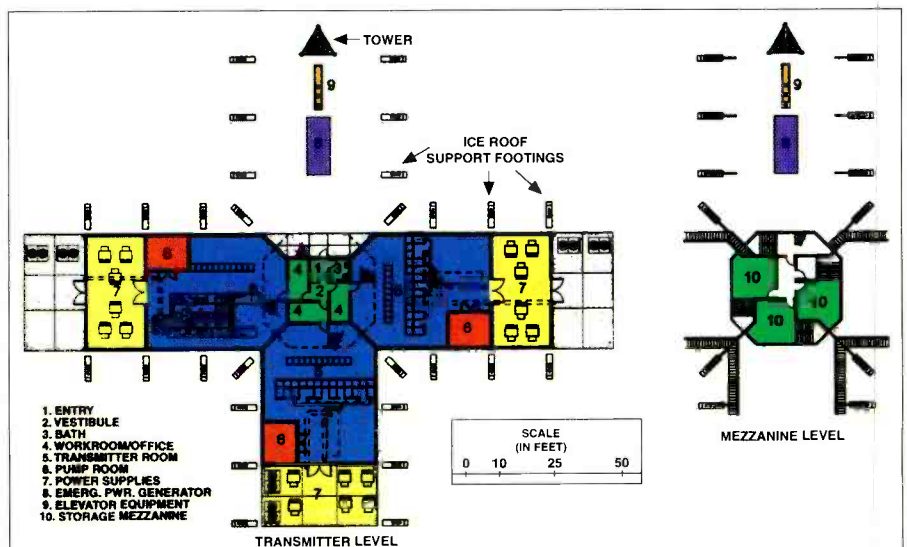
Floor plan of prototypical multistation transmitter building. (Design and drawing © 1994 Thomas G. Crowder, AIA, ARCHITEKTUR.)
